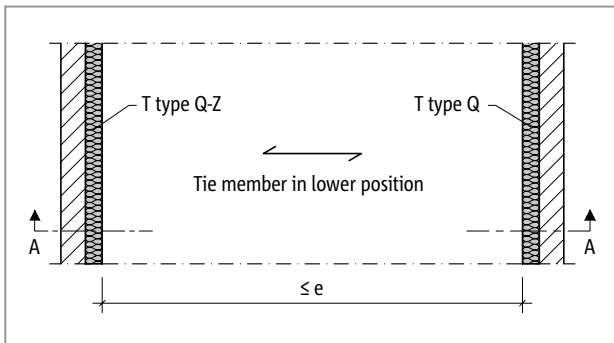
Schöck Isokorb® T type Q-Z, Q: One-way reinforced reinforced concrete slab
